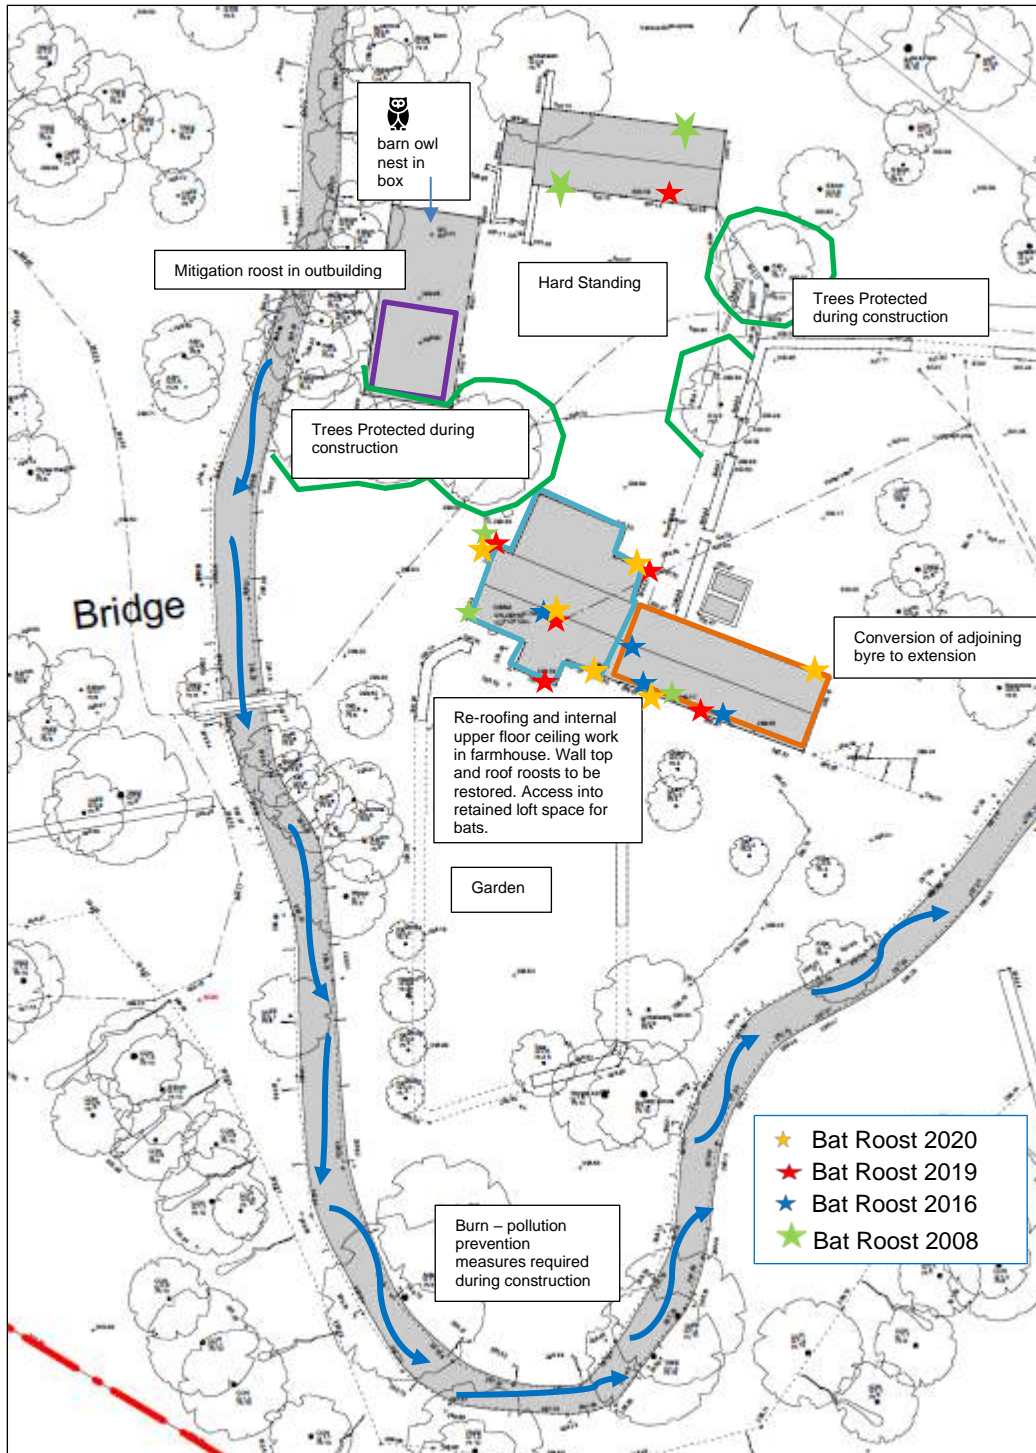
Ecological Constraints and Opportunities Plan (on existing site Plan)
